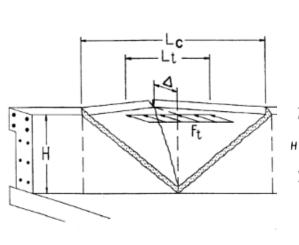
Yield Line Analysis of Concrete Parapet Walls for Impact within Wall Segment
